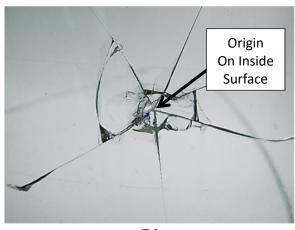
Similar Fracture Patterns with Different Breakage Modes
